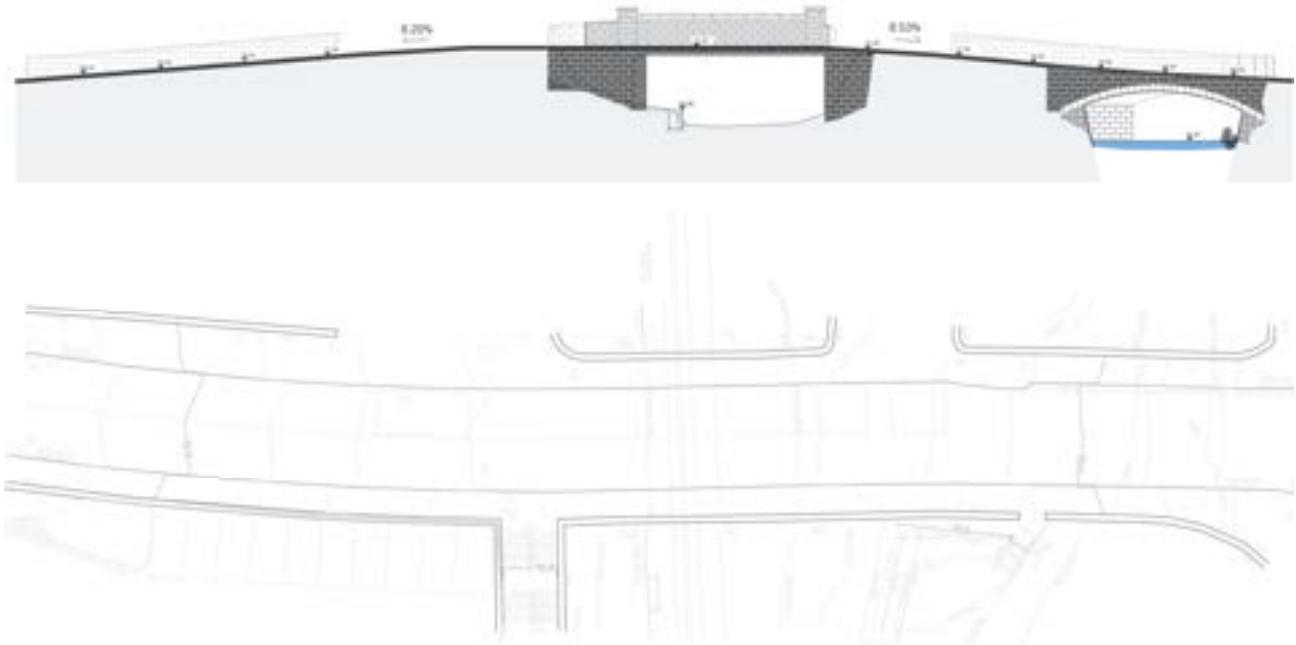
OBG25 bridge section and plan indicating the slope on each side from the highest point
